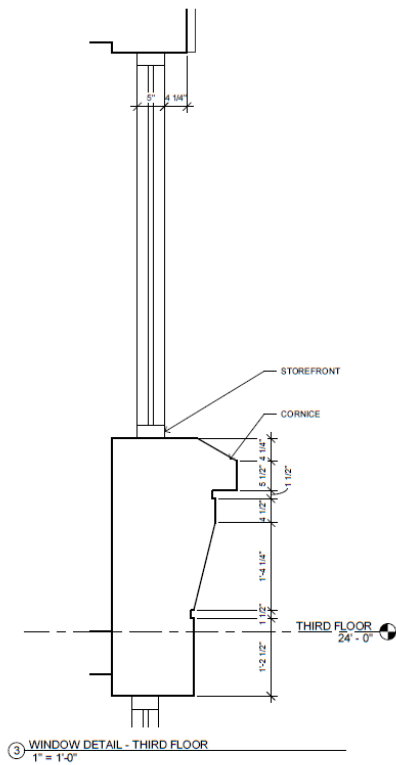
Cornice detail, 1208-1226 E. Baltimore Street, Colimore Architects, July 20, 2018
